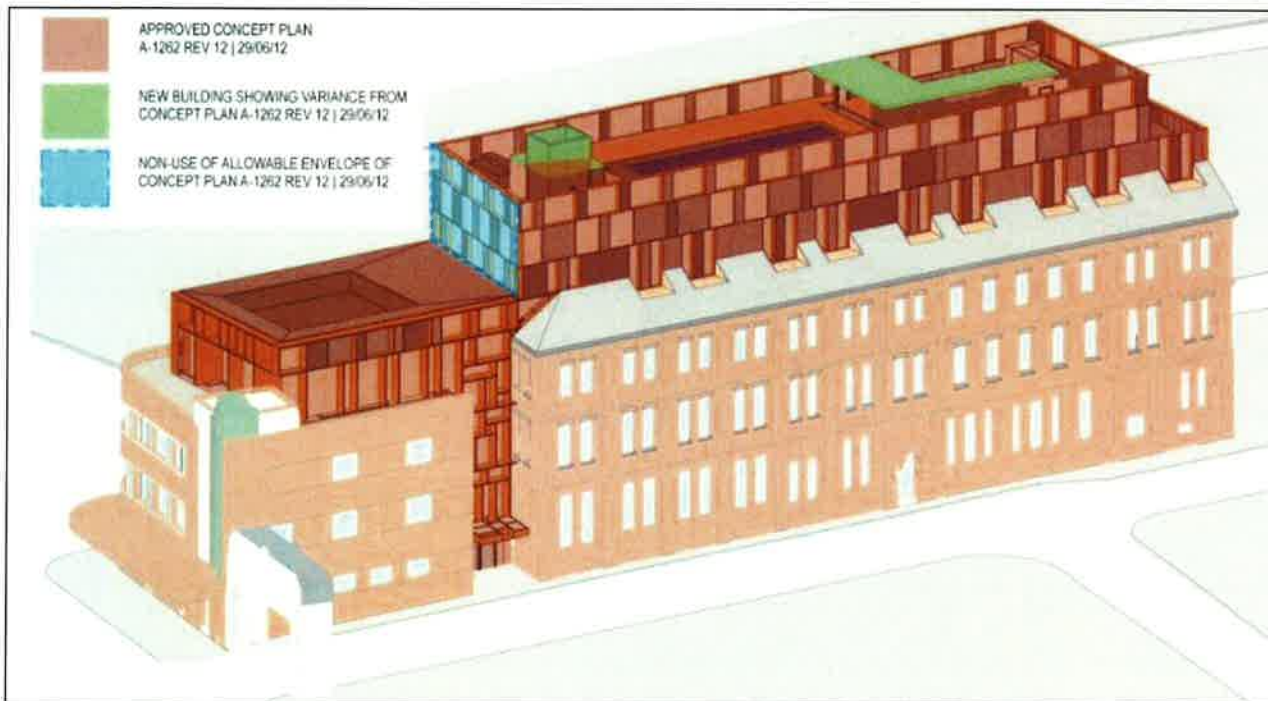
Concept Plan envelope analysis view from north-west. Source: Proponent's EA
